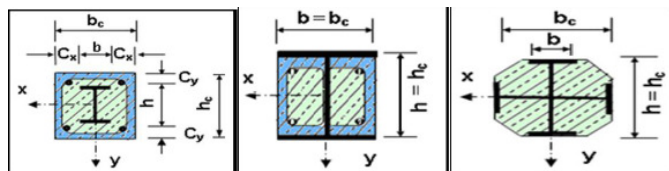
Cross Section of Fully and Partially Concrete Encased Columns
